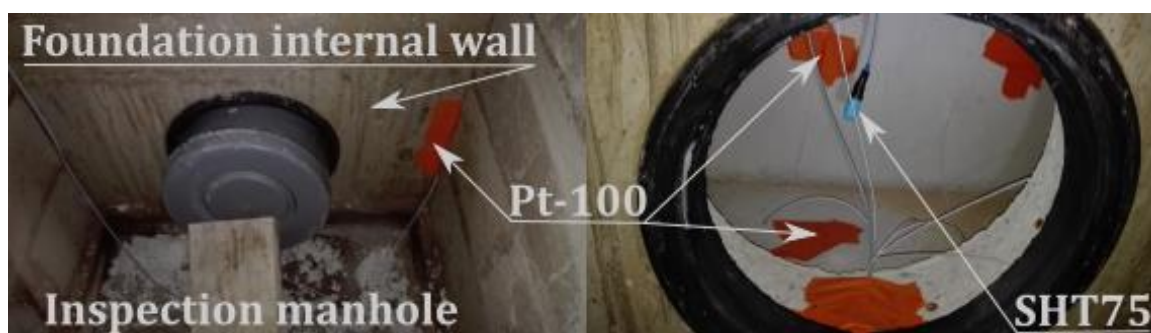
Inspection manhole: access to the foundation cavity
